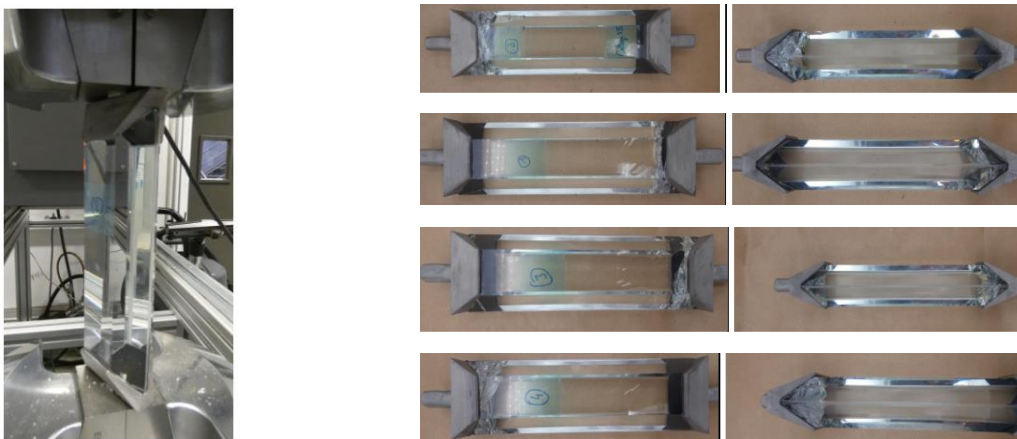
Left: tensile test configuration / Right: Photographs of fracture patterns.
